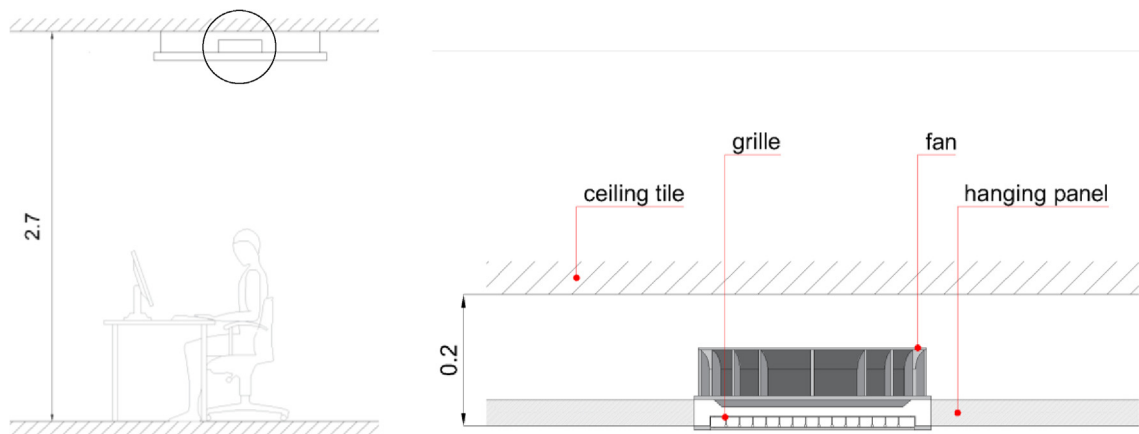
Section (left) and detail (right) of the arrangement of the hanging panel and fan. All values are in meters.
